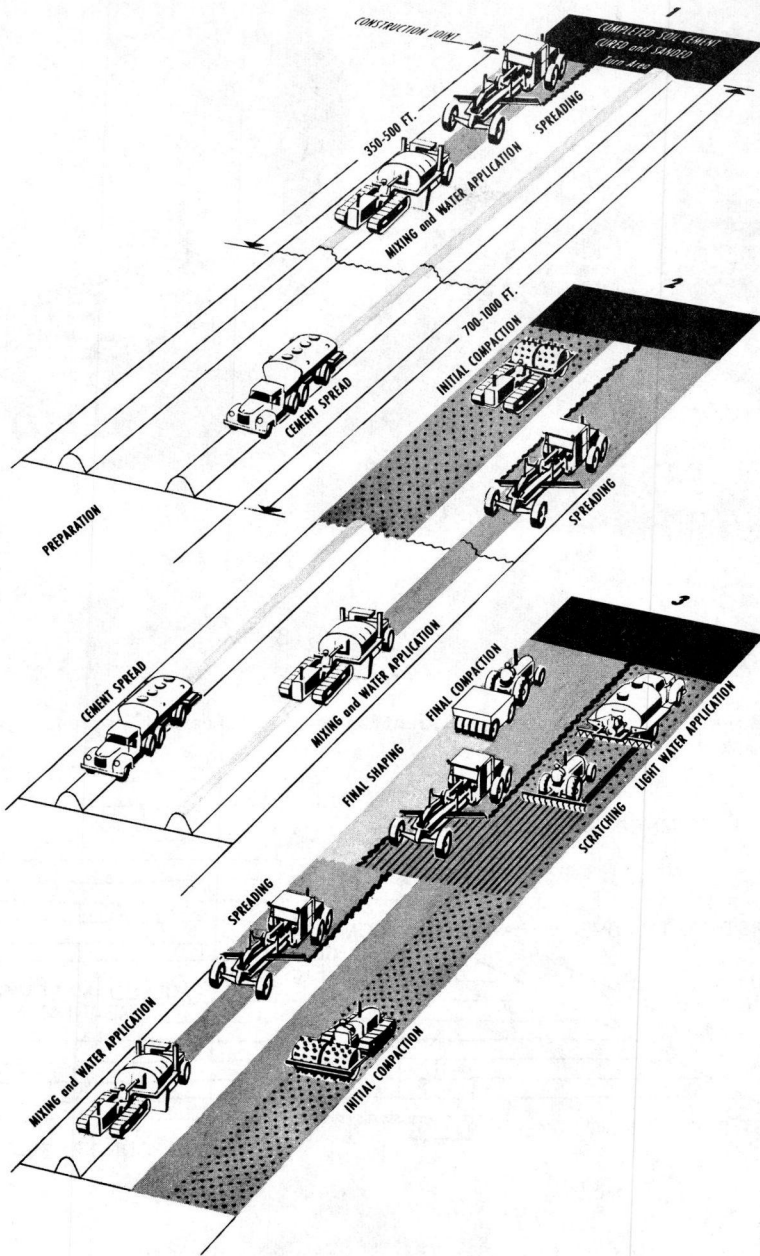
A. Diagrammatic sketch of soil-cement processing operations with a windrow-type traveling mixing machine.
